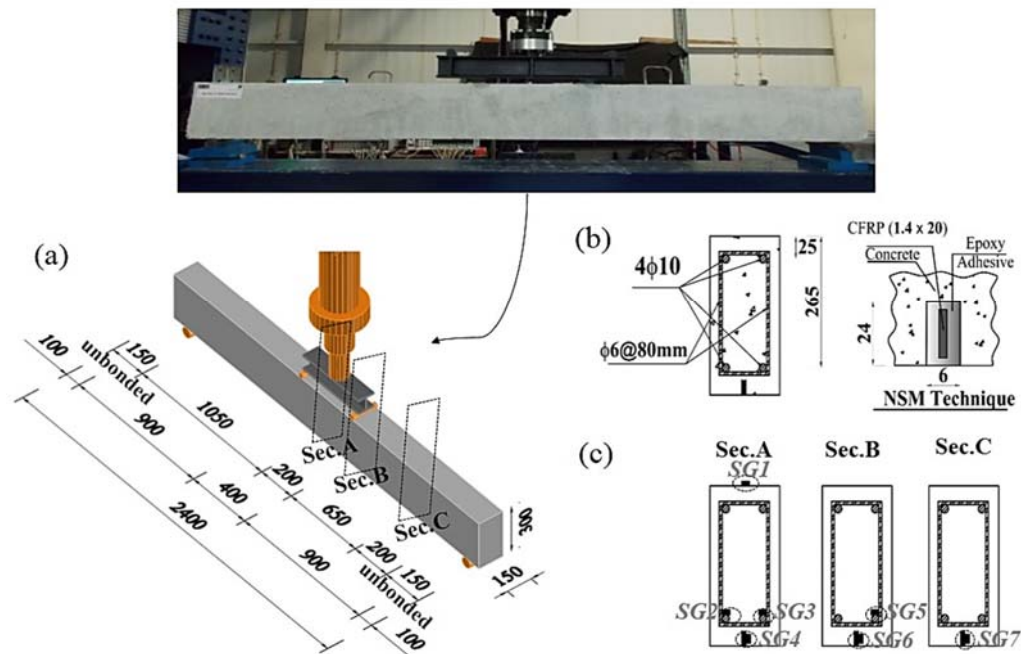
Characteristics of the tested type of beams: a) geometry, support and loading conditions, b) steel and CFRP reinforcements, c) positioning of the strain gauges (dimensions in mm)
